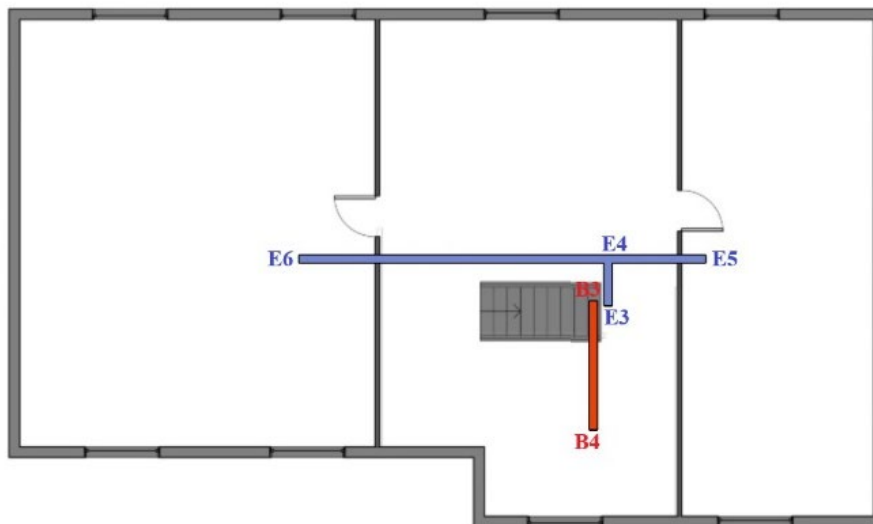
Ventilation duct design for Building 1, basement. Red lines are exhaust air, blue lines are supply air.
